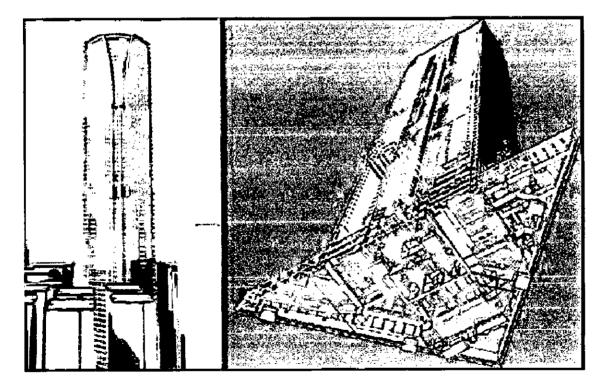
(a): Building Information Model of One Island East (OIE) Project.
